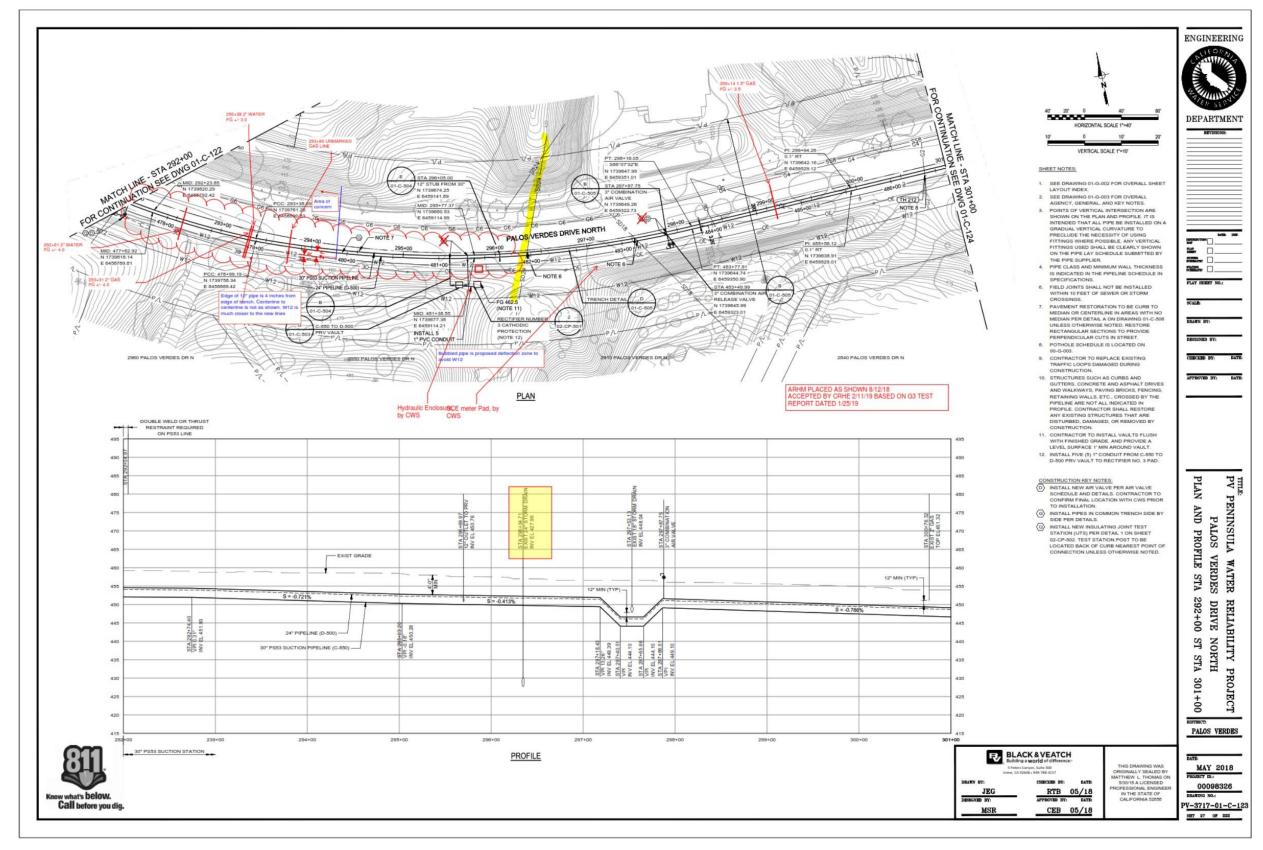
As-Built Drawing Showing Storm Drain Location, West of London Lane
